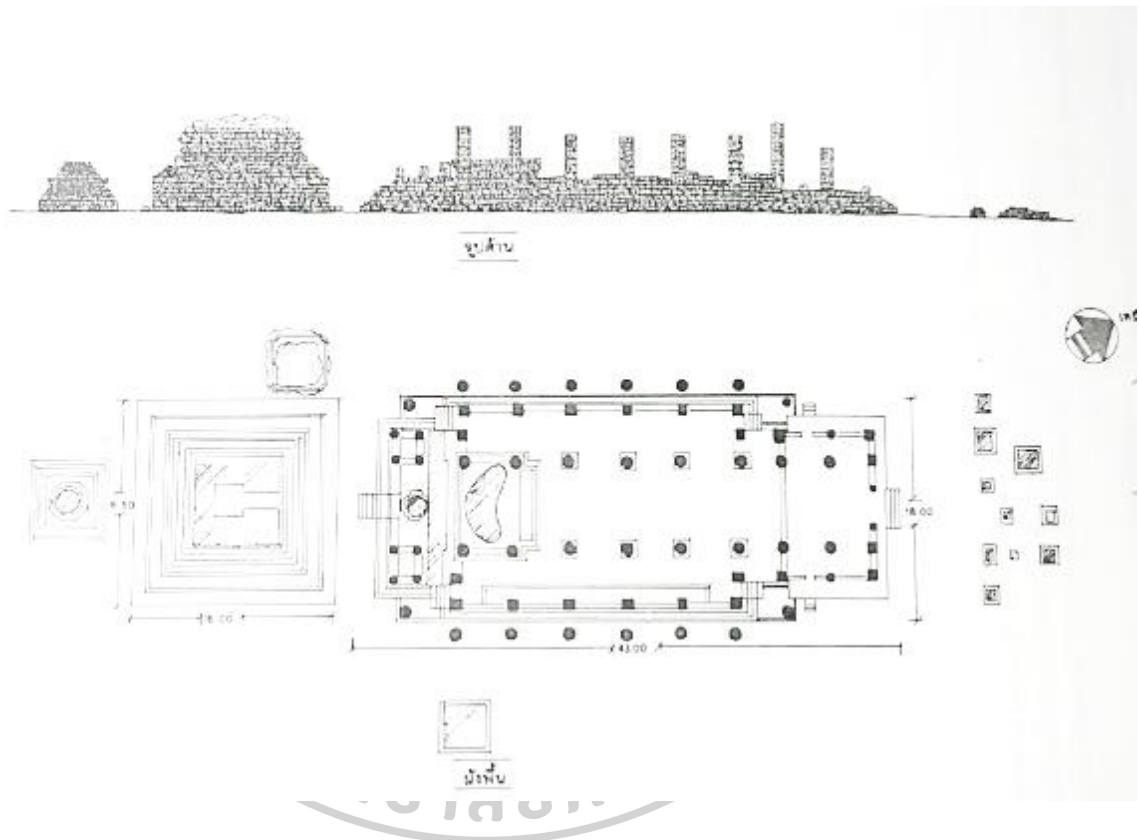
Plan and Elevation of Wat Noi Cham Pi
